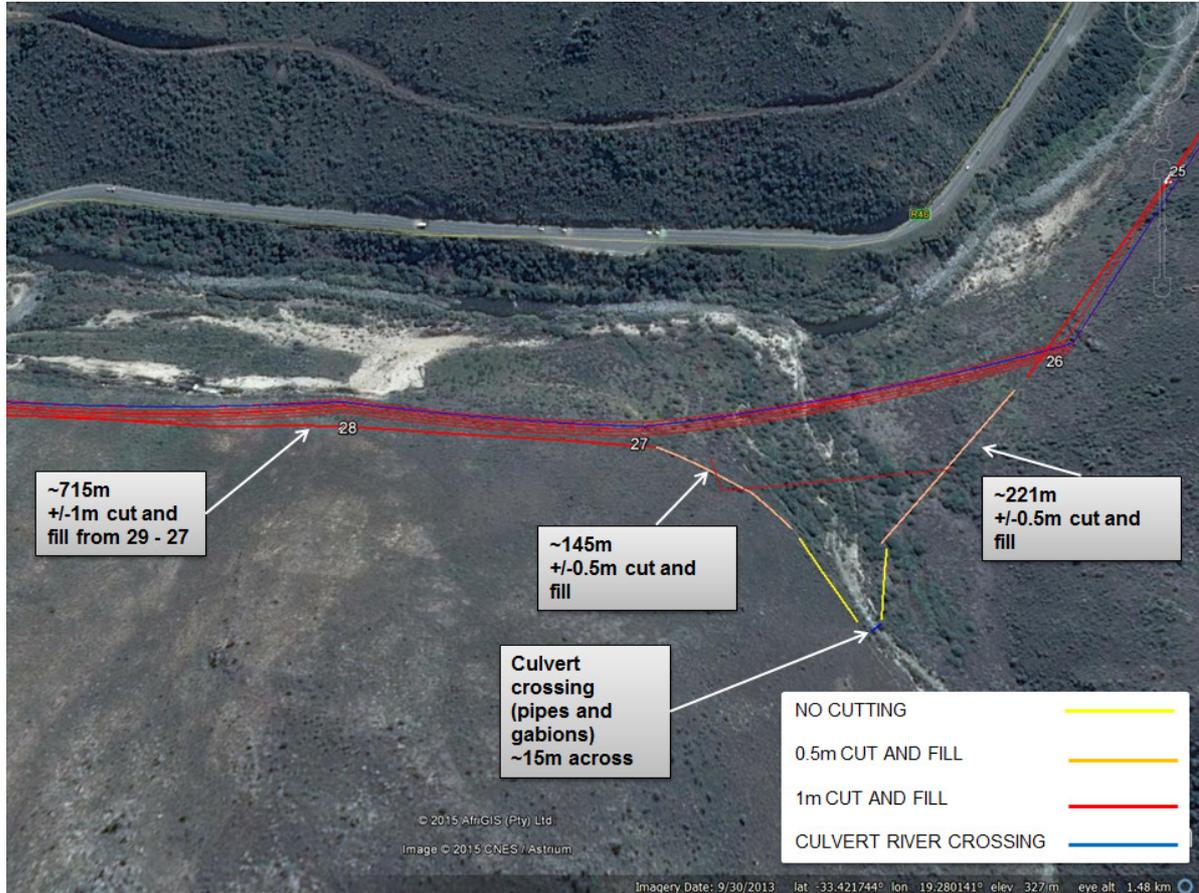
Marked river crossing and cut and fill requirements to tower positions
